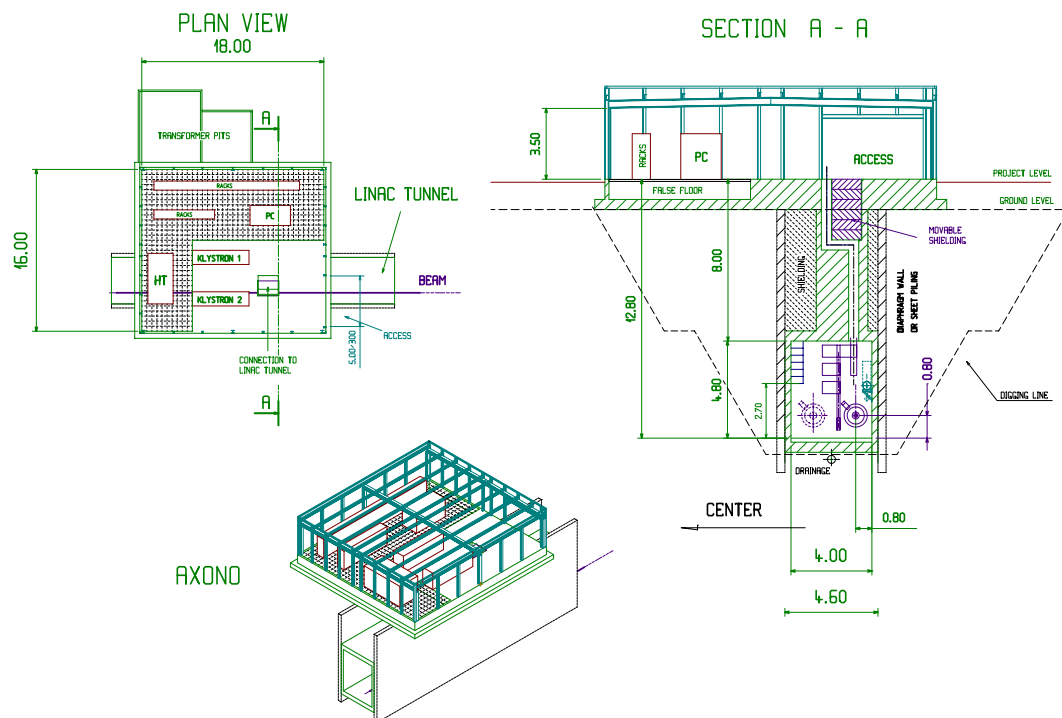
Klystron buildings, linac tunnel, plan view, cut, axonometric.
